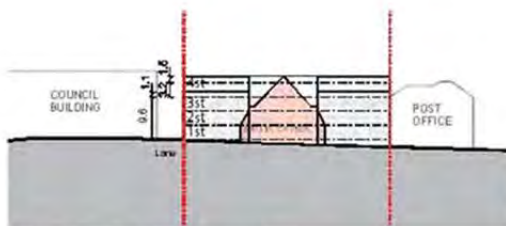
Wetherill Street - Building cross section (p. 194)
